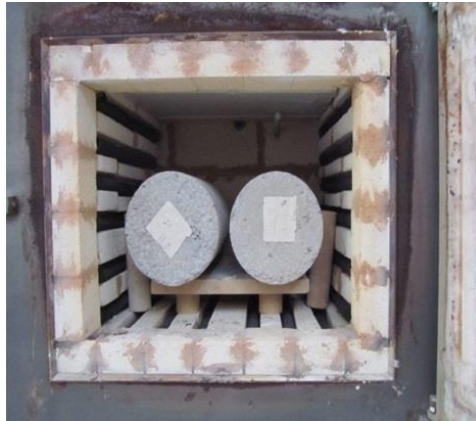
Furnace with concrete cylinders ready for heating (first part)
